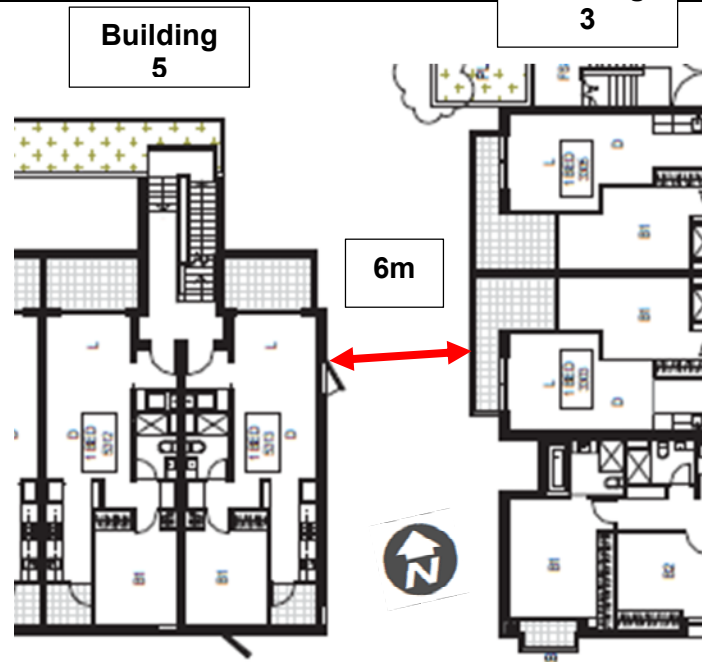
Separation distance between Buildings 5 (left) and 3 (right) on Level 3
